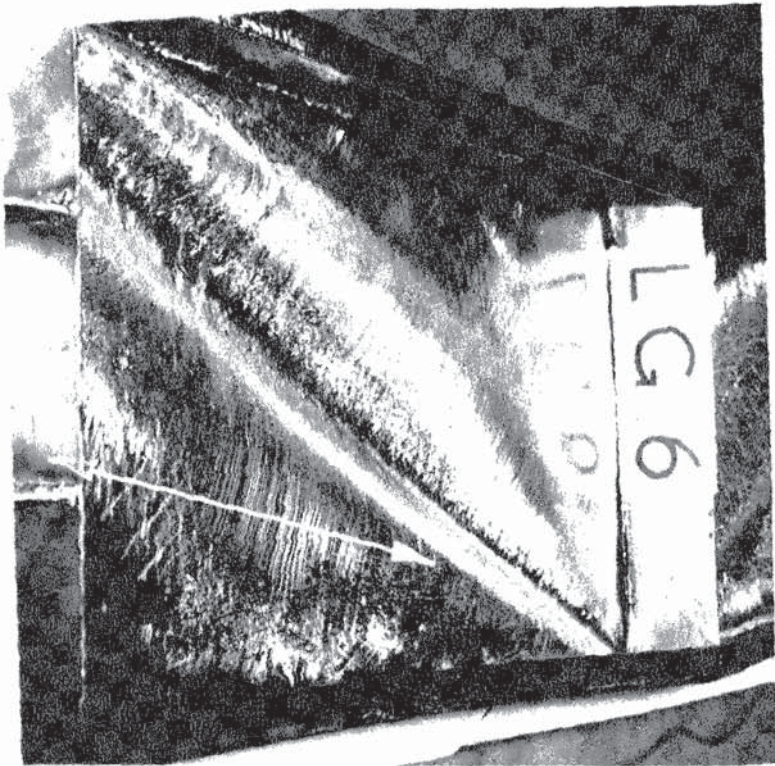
GIRDER LG6 AFTER TEST TO FAILURE. CRACKS IN BRITTLE LACQUER INDICATE DIRECTION OF PRINCIPAL TENSILE STRAINS
